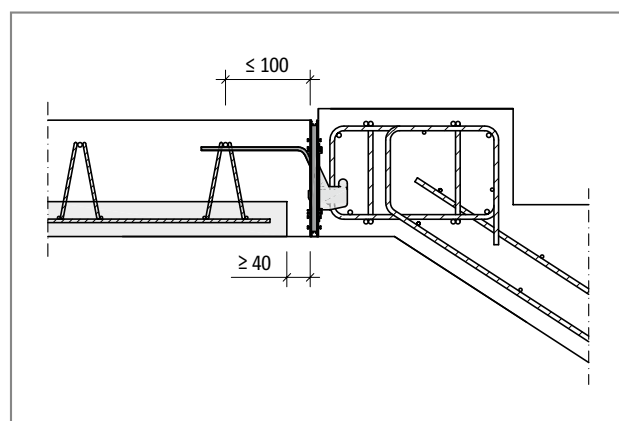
Schöck Tronsole® type T: Installation in combination with prefabricated floors, compression joint on floor side
